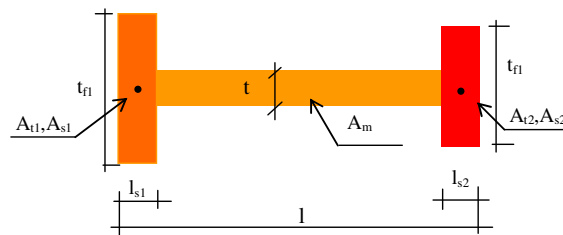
Equivalent I shape section of unreinforced masonry shear
